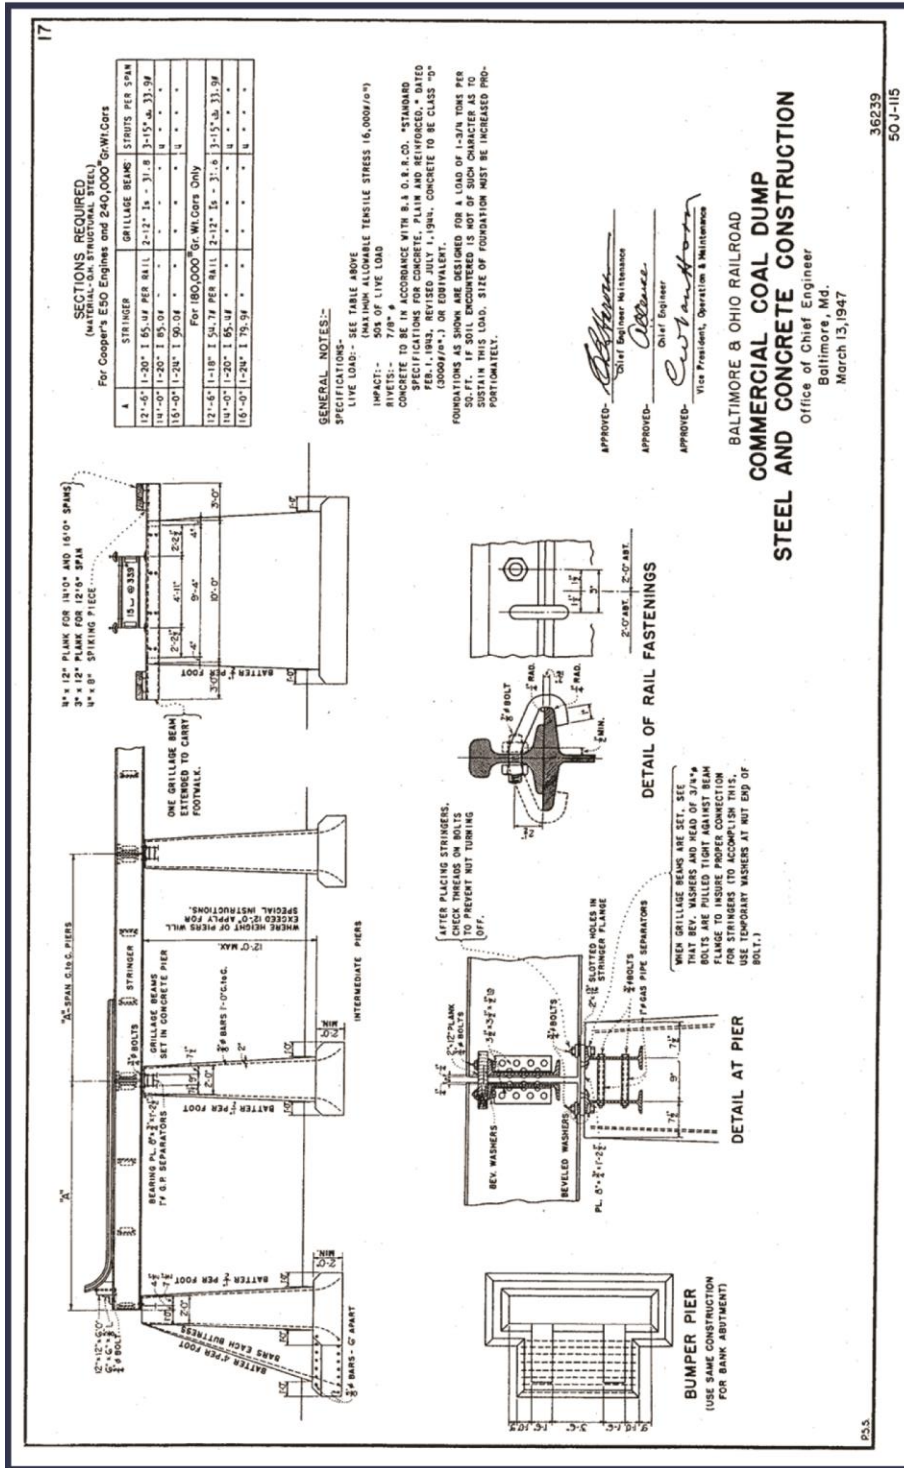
Baltimore & Ohio Railroad Steel and Concrete Commercial Dump, 1947.
